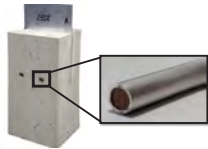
Aluminium/Wood hybrid system assembled with wood-filled aluminium hollow tube dowel [1]
